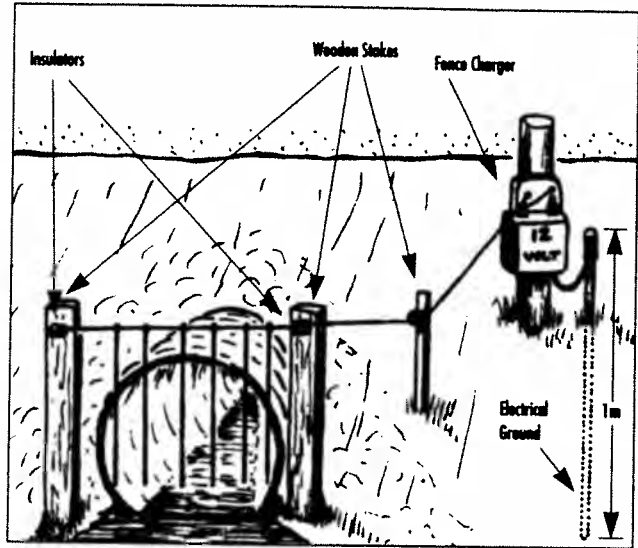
Electric Beaver Repelling Device for Protecting Culvert Entrance.
